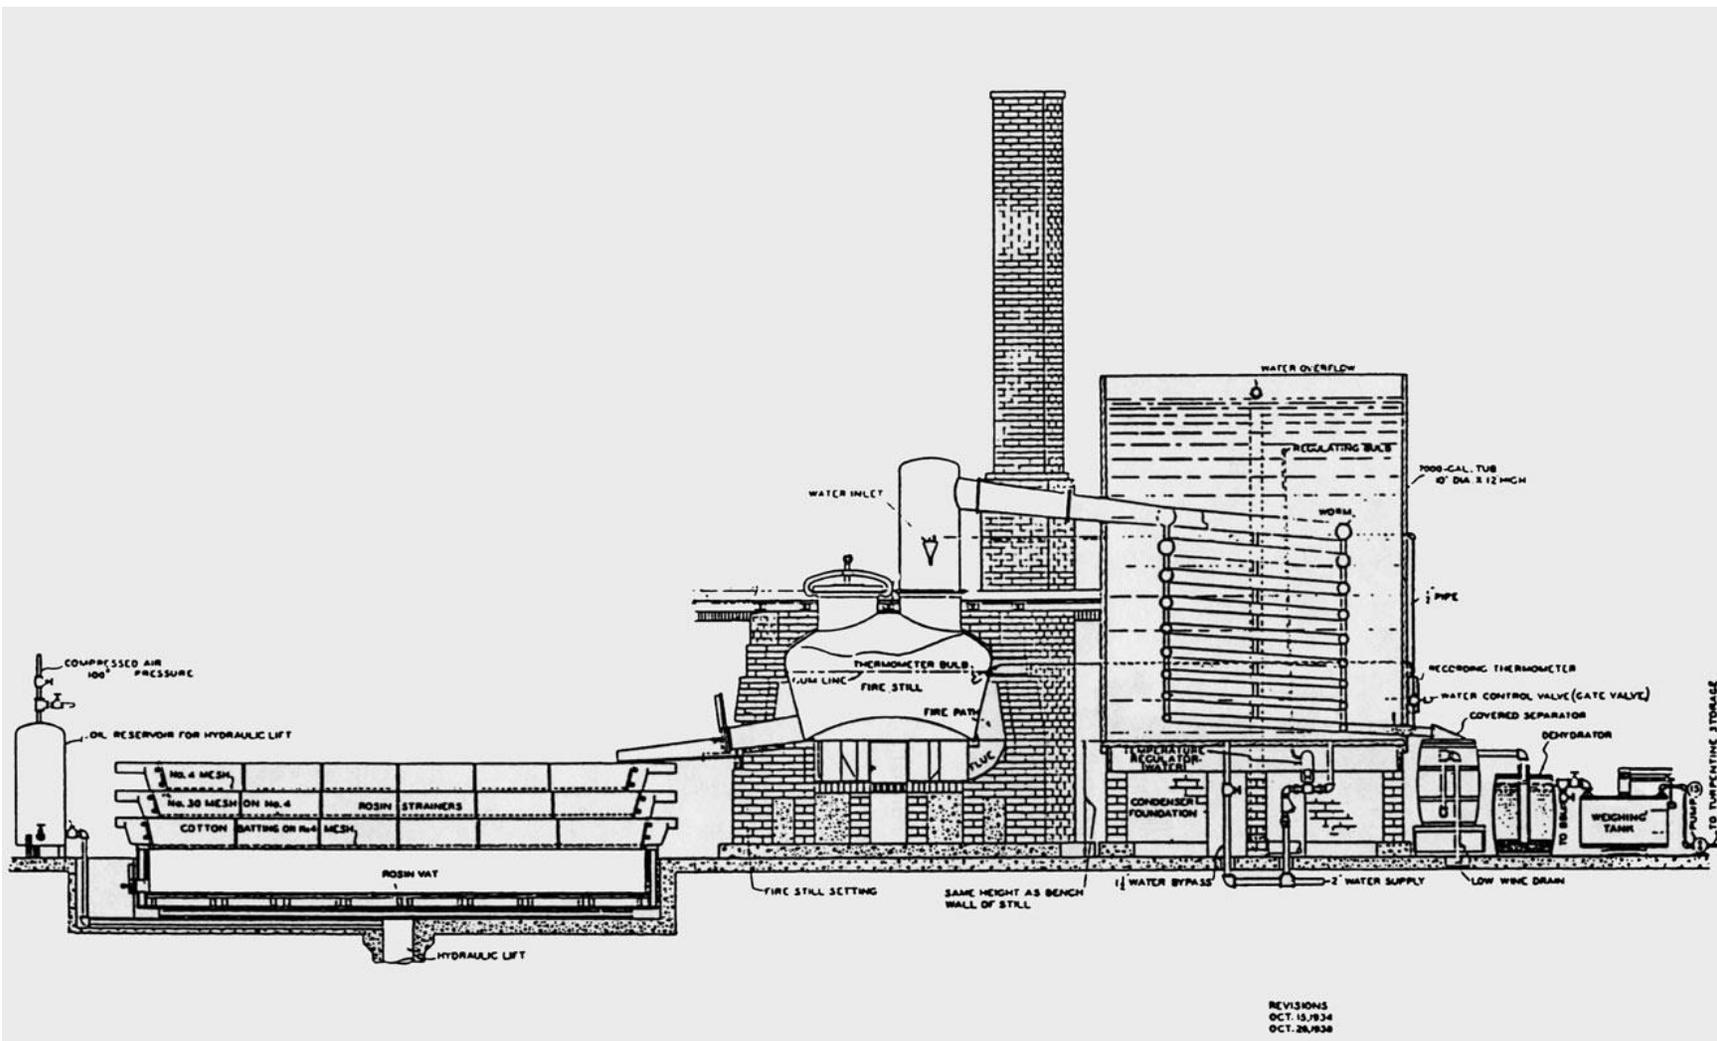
Engineering drawing of a fire turpentine still. (USDA, 1940)
